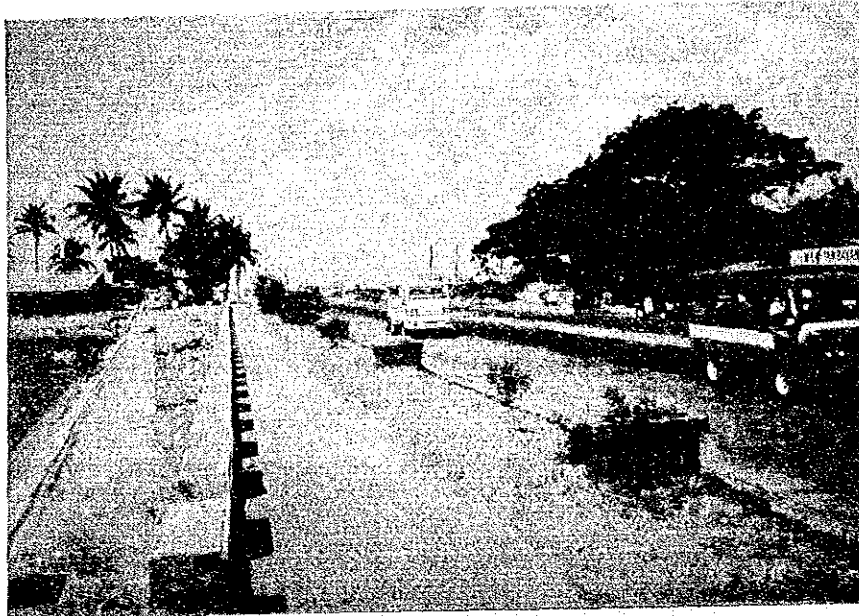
Existing Road Condition Connected to Ro/Ro
